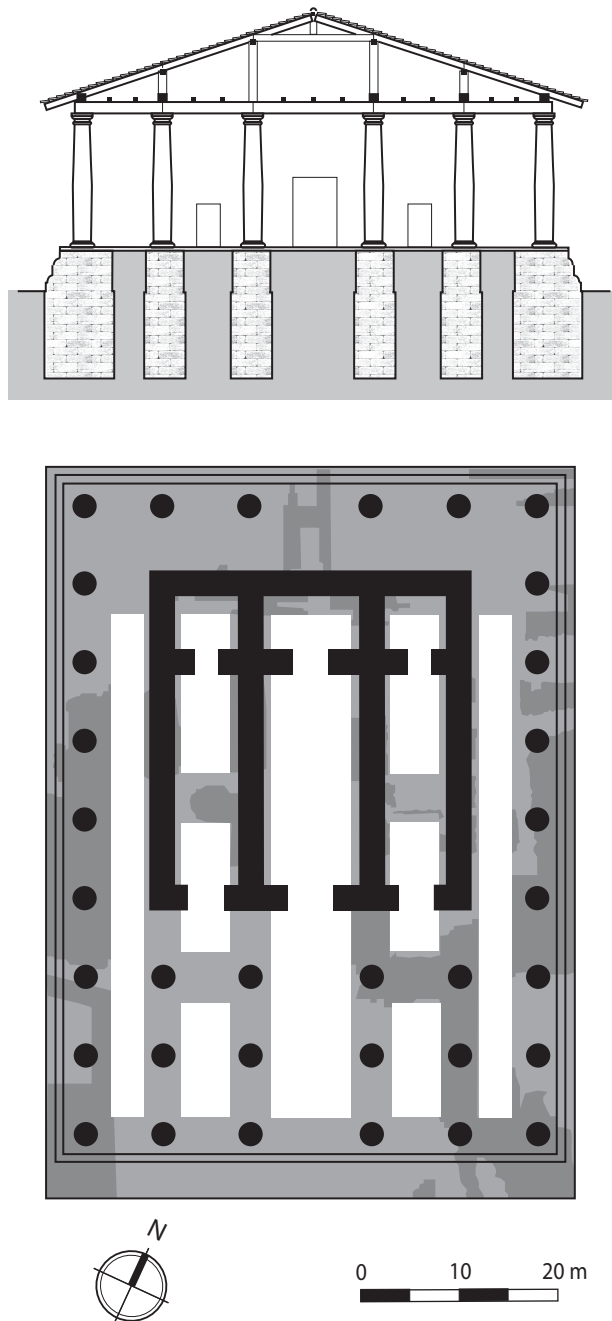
Restored hypothetical plan and elevation based on remaining foundations of the Temple of Jupiter Capitolinus, Rome; rendered by Diane Favro (after Somella).
